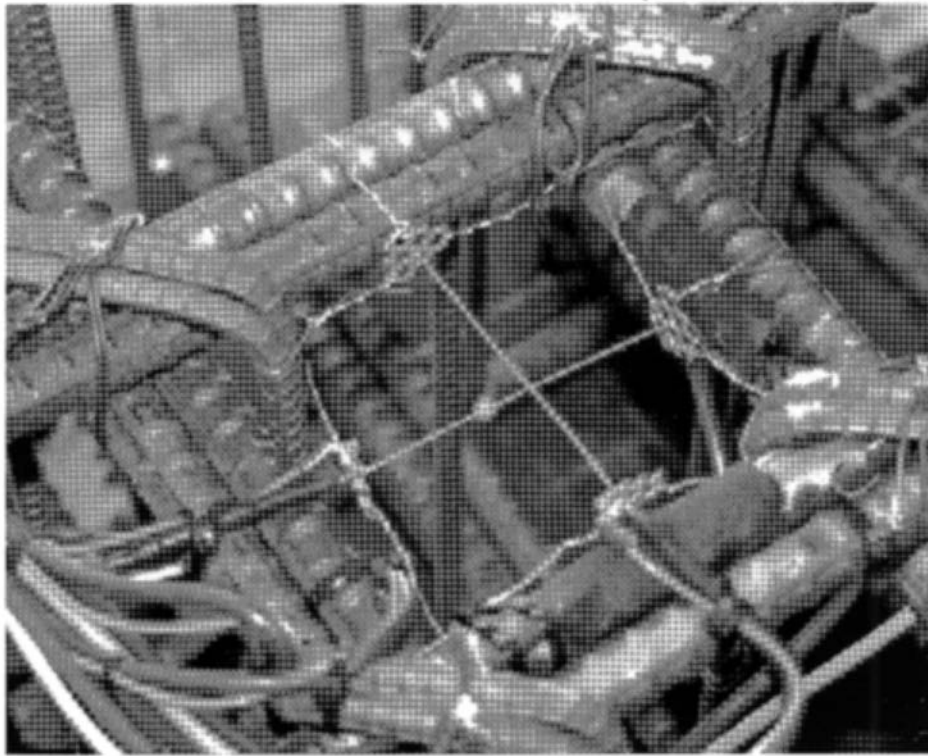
Concrete embedment gages mounted orthogonally in the same plane as the lower rebar mat.
